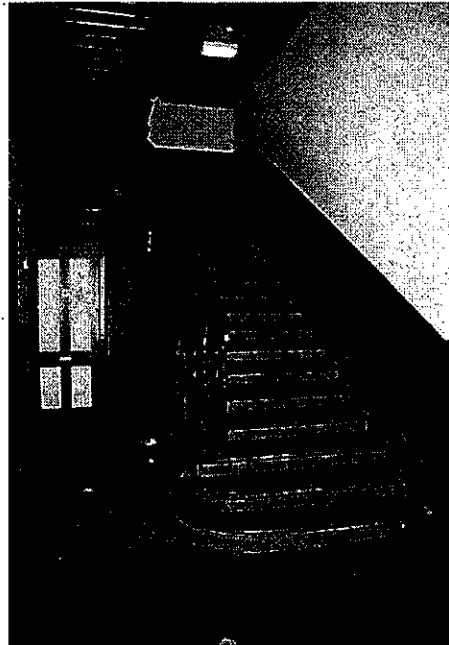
Interior, Entrance/Stair Hall (space FG05), showing original staircase.
